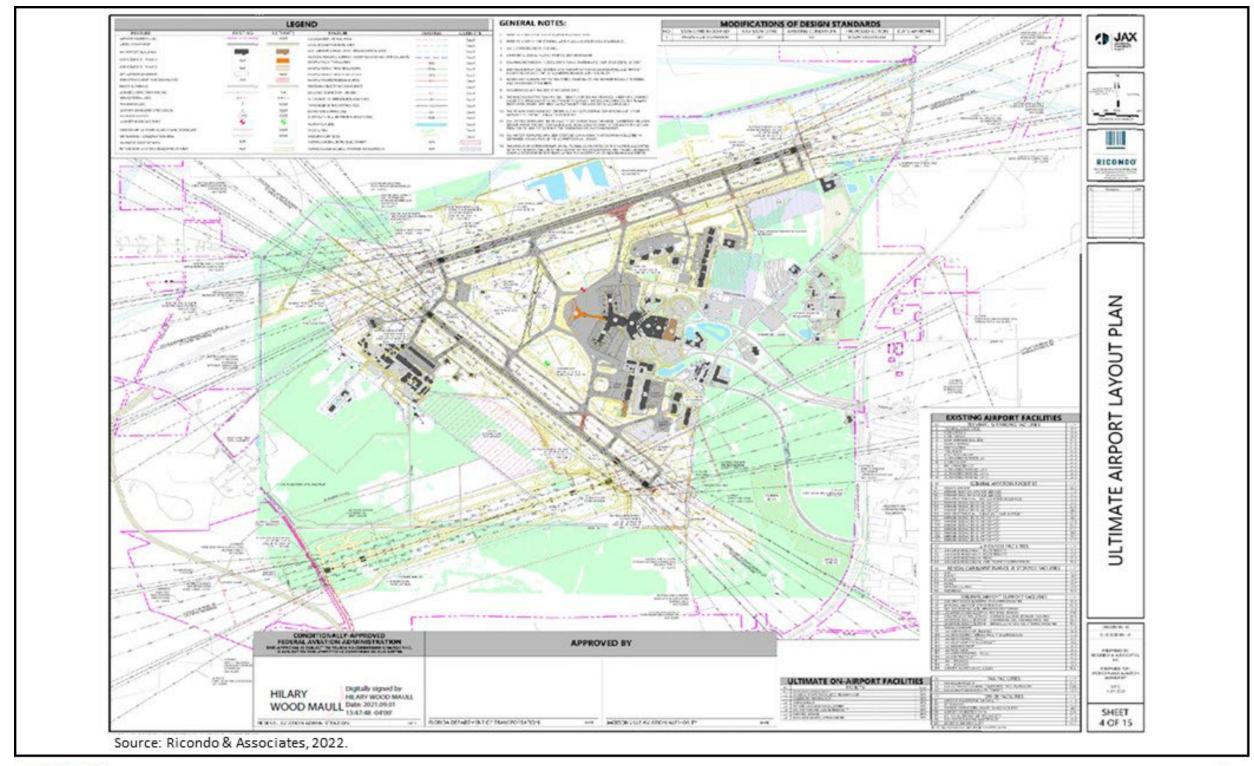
JACKSONVILLE INTERNATIONAL AIRPORT LAYOUT PLAN
